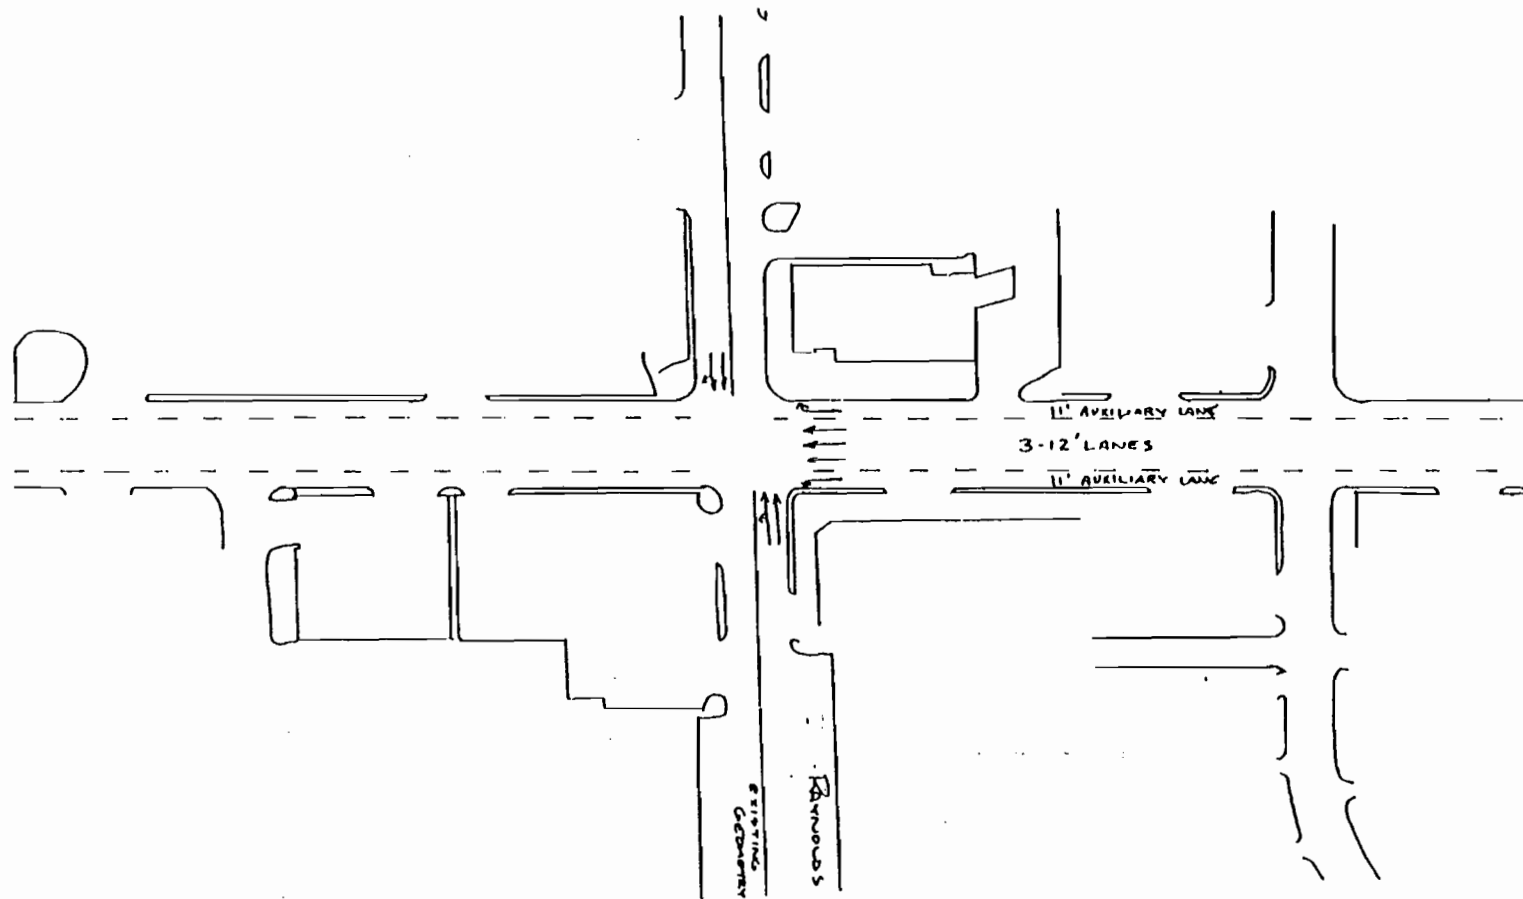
Desirable Right of Way at Reynolds Street (General Cross Section)
